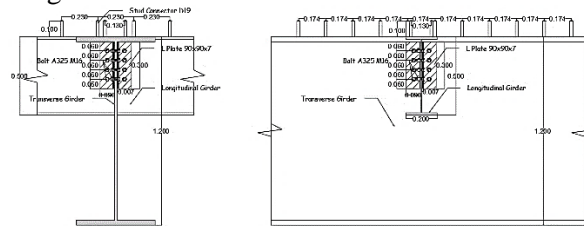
Detail Bolt Connection Longitudinal to Transverse Girder
